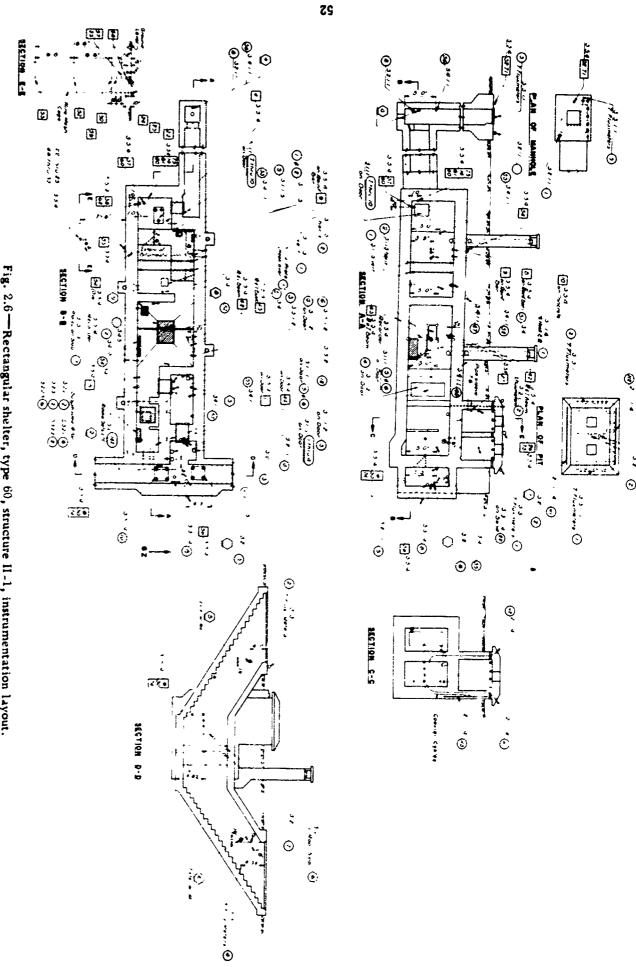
Rectangular shelter, type 60, structure II-1, instrumentation layout.
